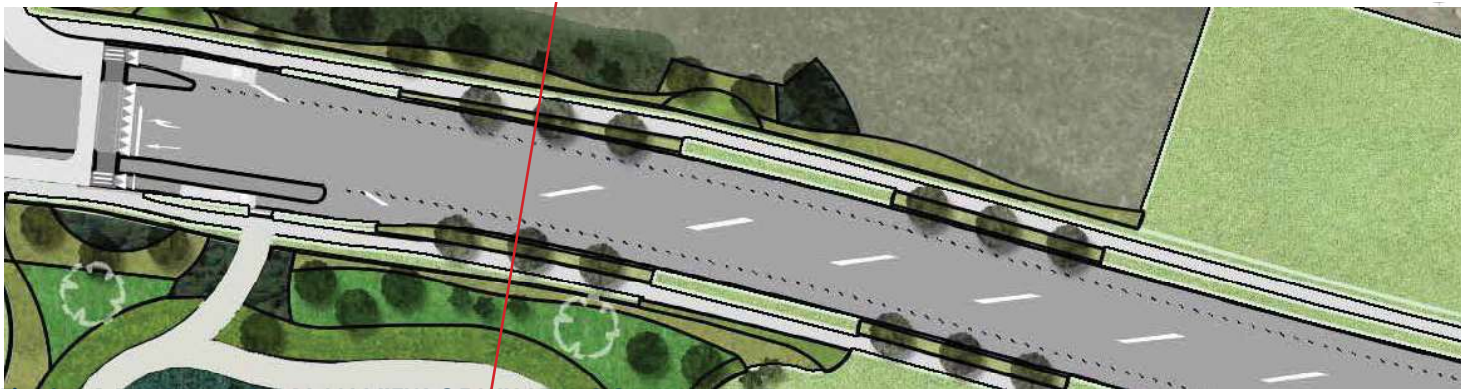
ILLUSTRATION PLAN VIEW OF WHATUKOORURU DRIVE
